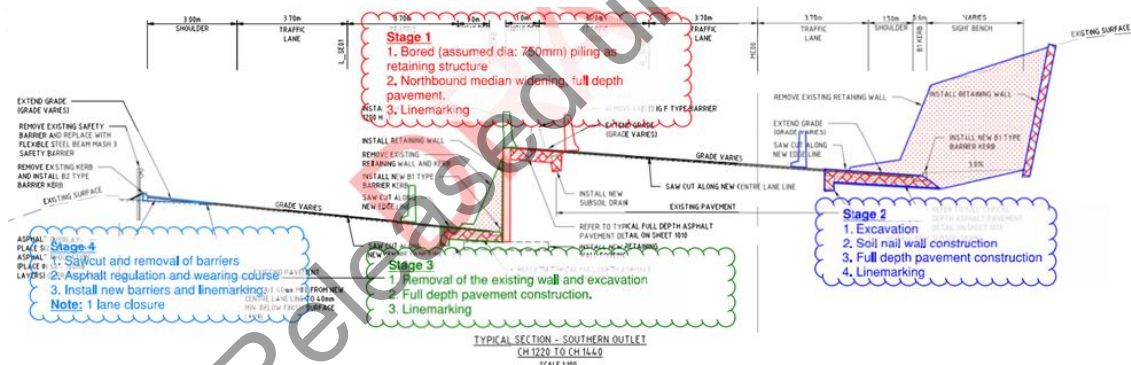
Typical section - Southern Outlet Ch. 1220 to Ch. 1440
